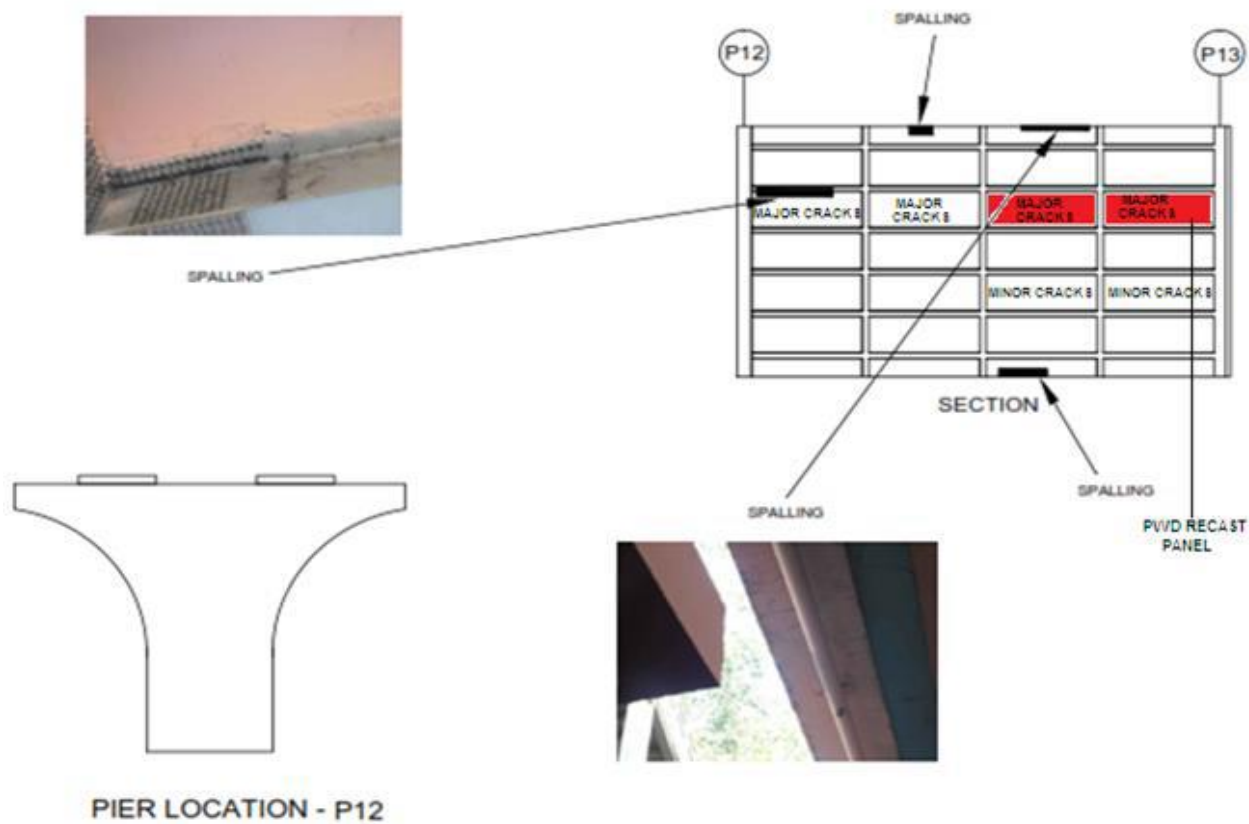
Major damaged panel with minor cracks in between P12-P13
